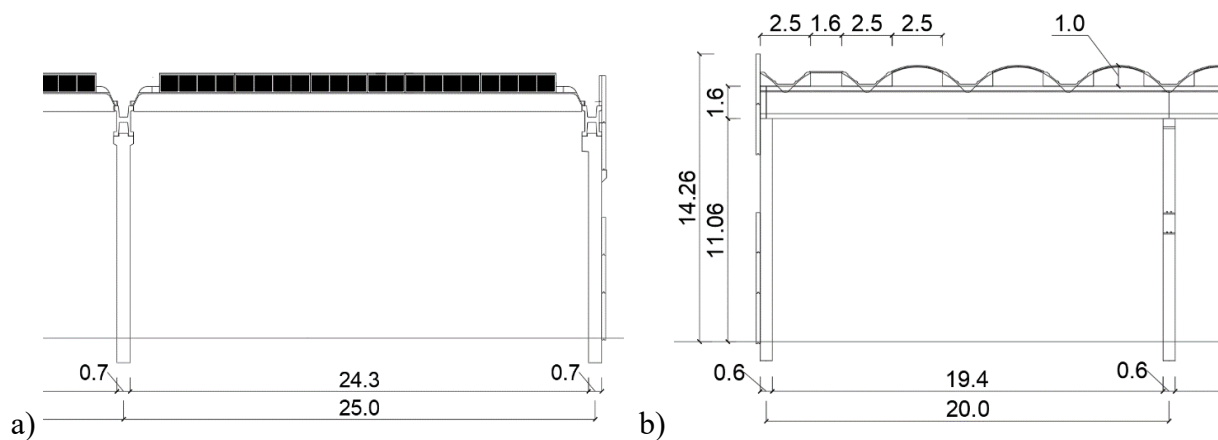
a) Cross-section of the EE3 building (Units: m). b) beam column connection details.
